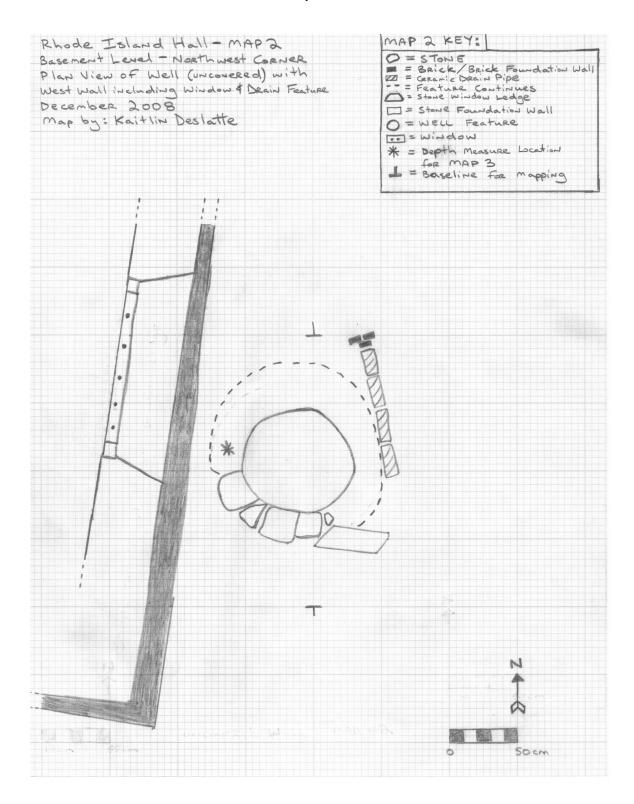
Survey Map 2 illustrates the plan view for some of the uncovered well stones, the terracotta drainage pipe system and west foundation wall with window.
